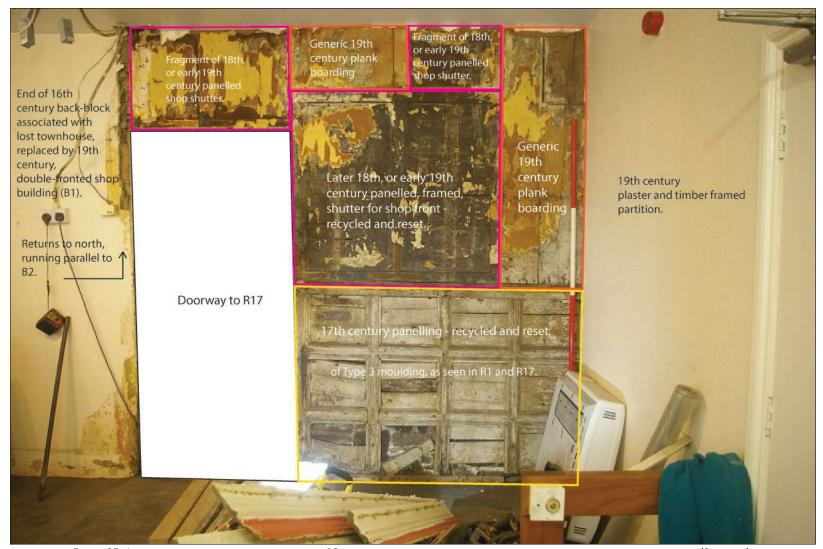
ANNOTATED PHOTOGRAPH OF NORTH WALL OF R2, SHOWING AREAS OF RECYCLED PANELLING AND PLANK BOARDING; FROM THE SOUTH (2M SCALE).
